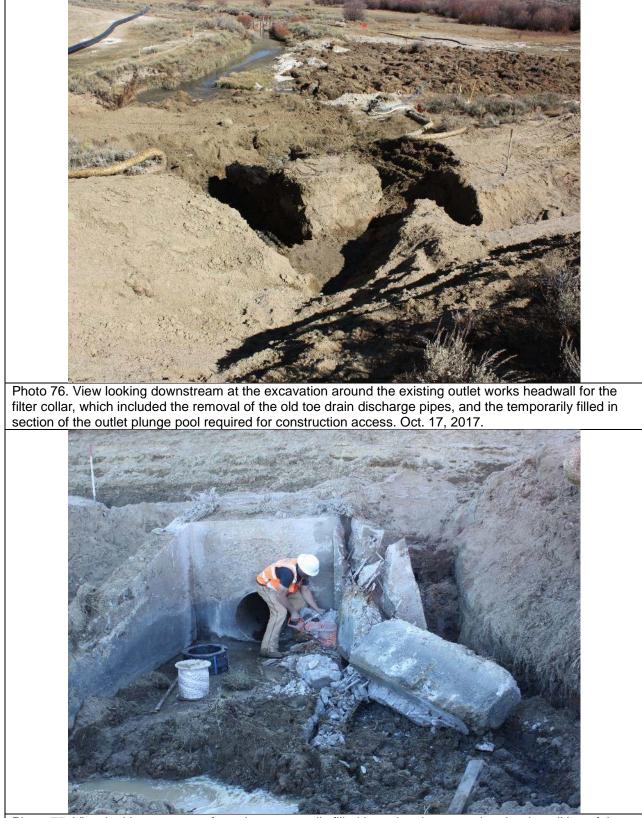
View looking upstream from the temporarily filled in outlet plunge pool at the demolition of the existing outlet structure wing walls. Oct. 17, 2017.
